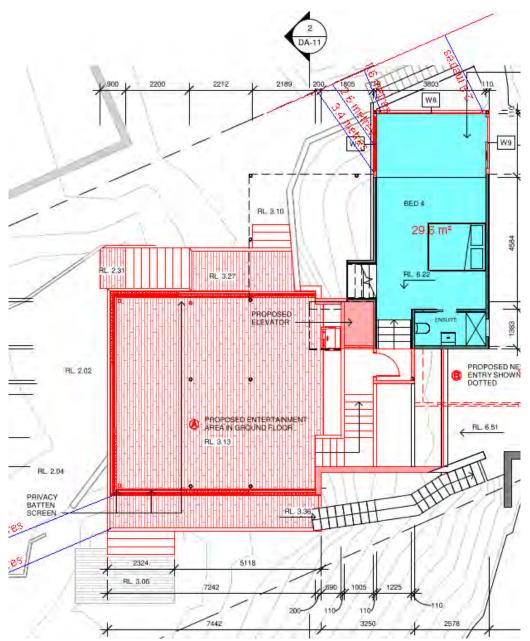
Demonstrating windows proposed for Bedroom 4 - W7 facing west, W8 facing north and W9 facing east
